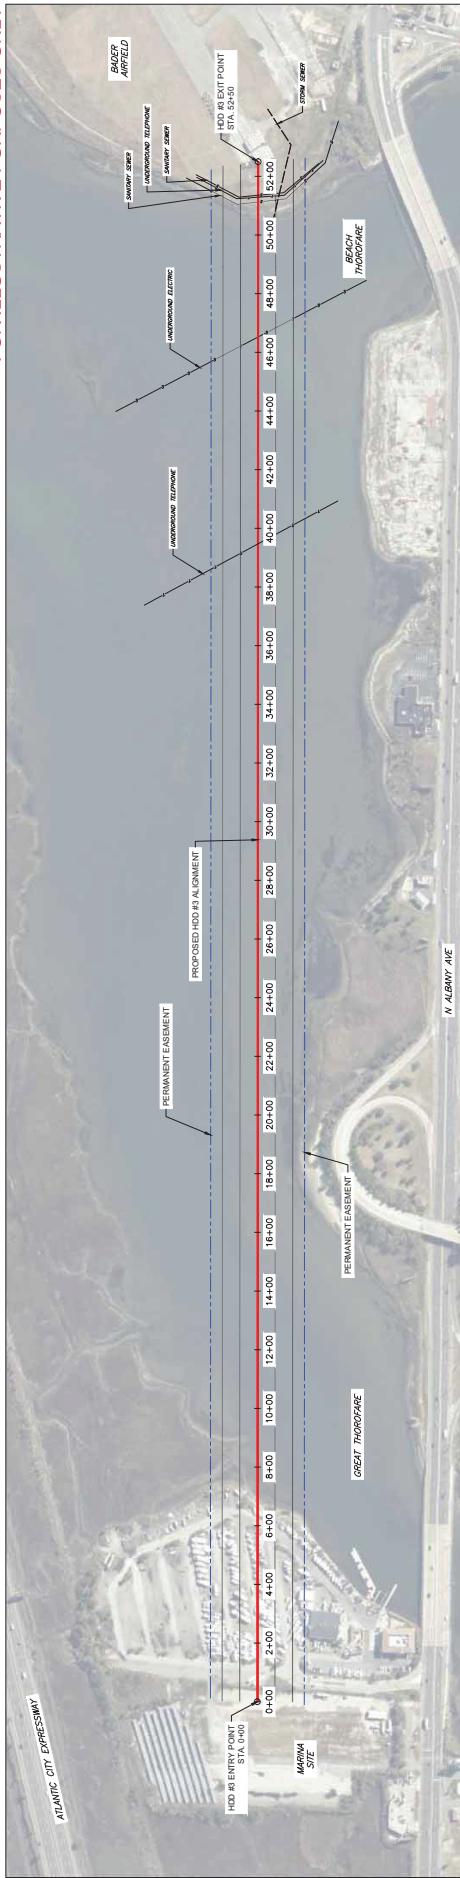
Great Thorofare Crossing #1 HDD Plan and Profile
